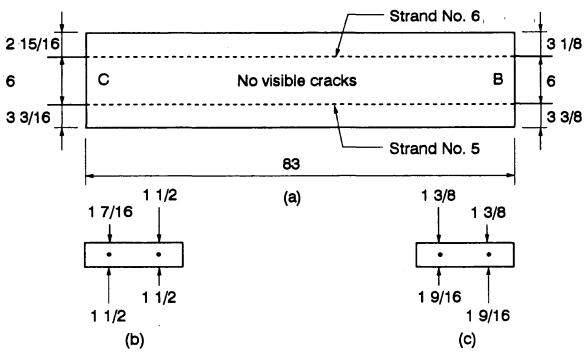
Specimen No. 2-3.0TC-6 (dimensions shown in inches): (a) plan view; (b) end view at C; (c) end view at B
